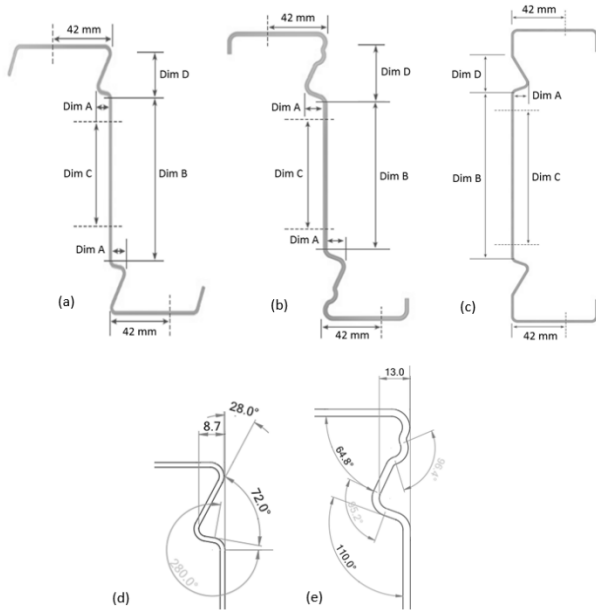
Cross sections (a) zed 145-170 mm deep sections, (b) zed 200-305 mm deep sections, (c) channel 145-305 mm deep sections, (d) unsymmetrical stiffeners, and (e) unsymmetrical stiffeners with additional bends.
